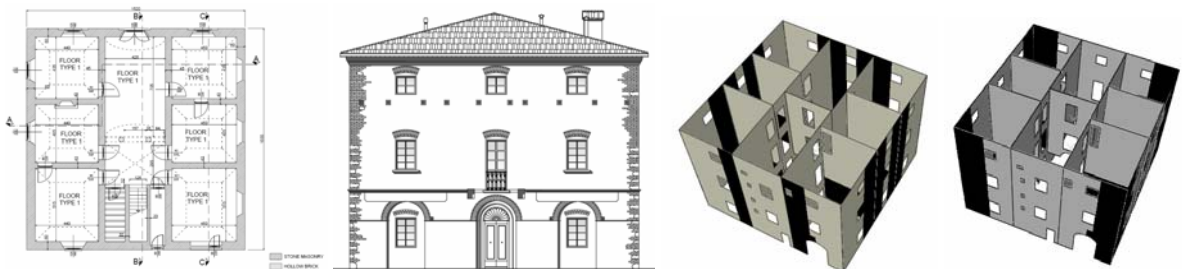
Horizontal section and main façade of the masonry building and placing of the reinforcing elements.
